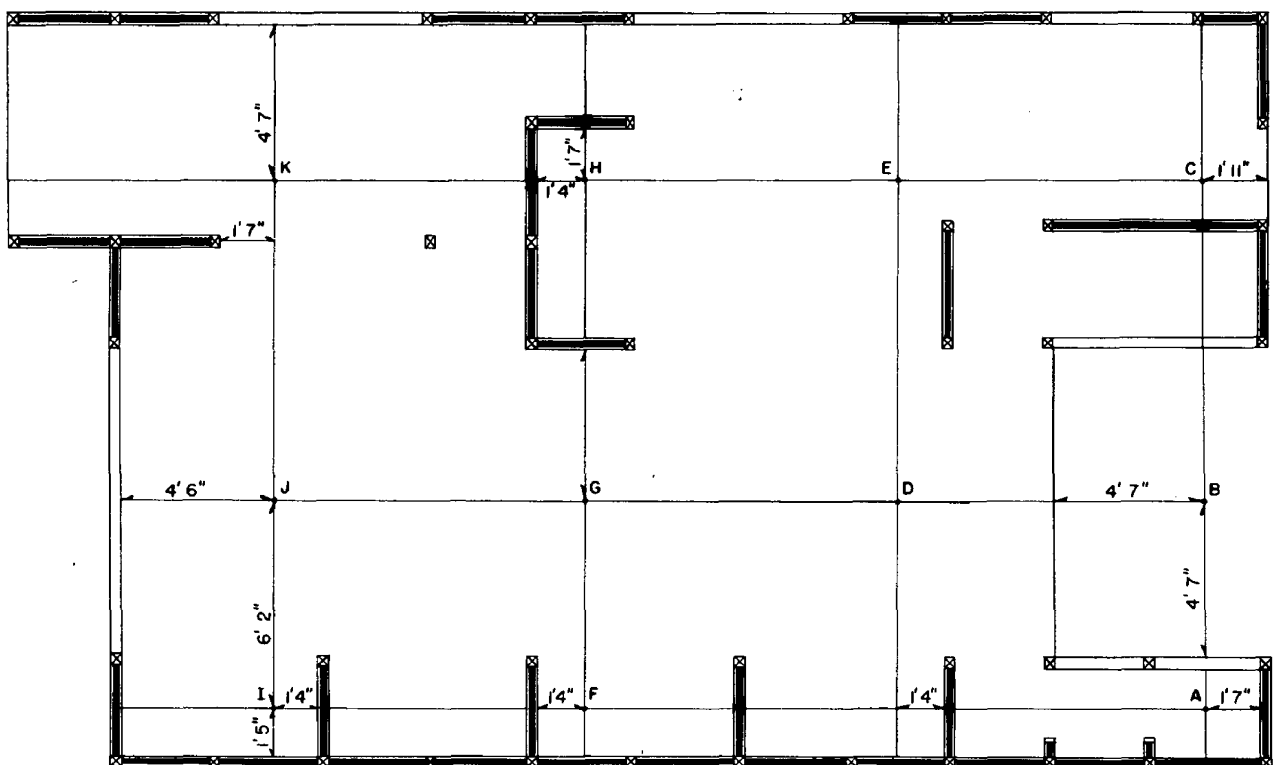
First-floor plan of type B Japanese-house facsimile.
